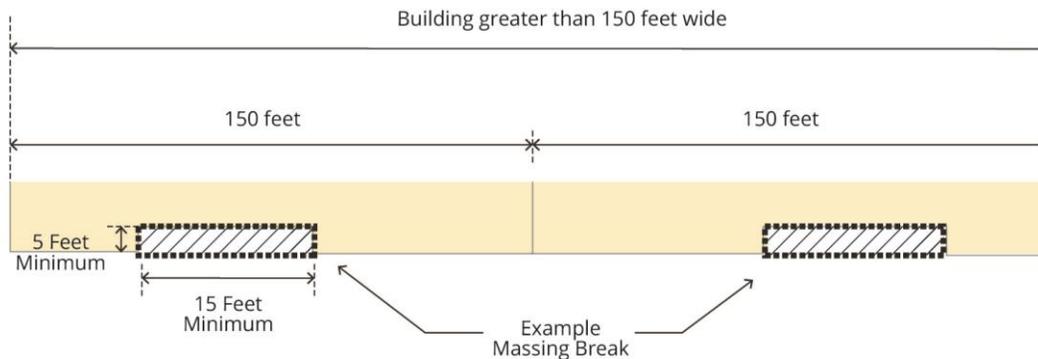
C MULTI-UNIT DWELLINGS, MASSING INCREMENT
